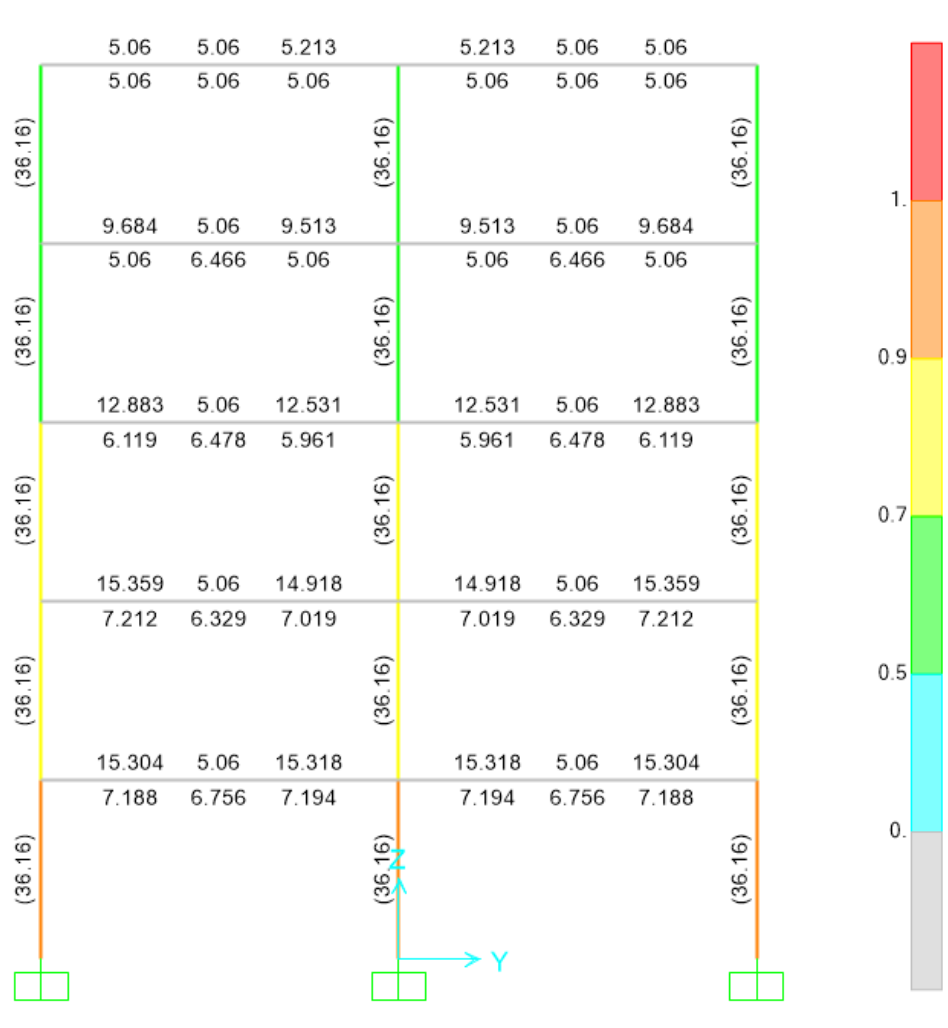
Check of demand/capacity ratio for columns in the most external transversal frames, maximum amount of required rebars in the beams (in cm^2 , on the second floor).
